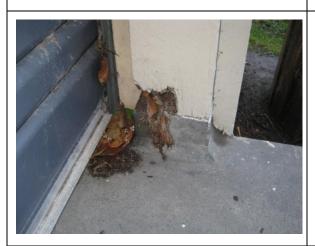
Existing impact damage to timber column embedded into concrete wall on north side.
